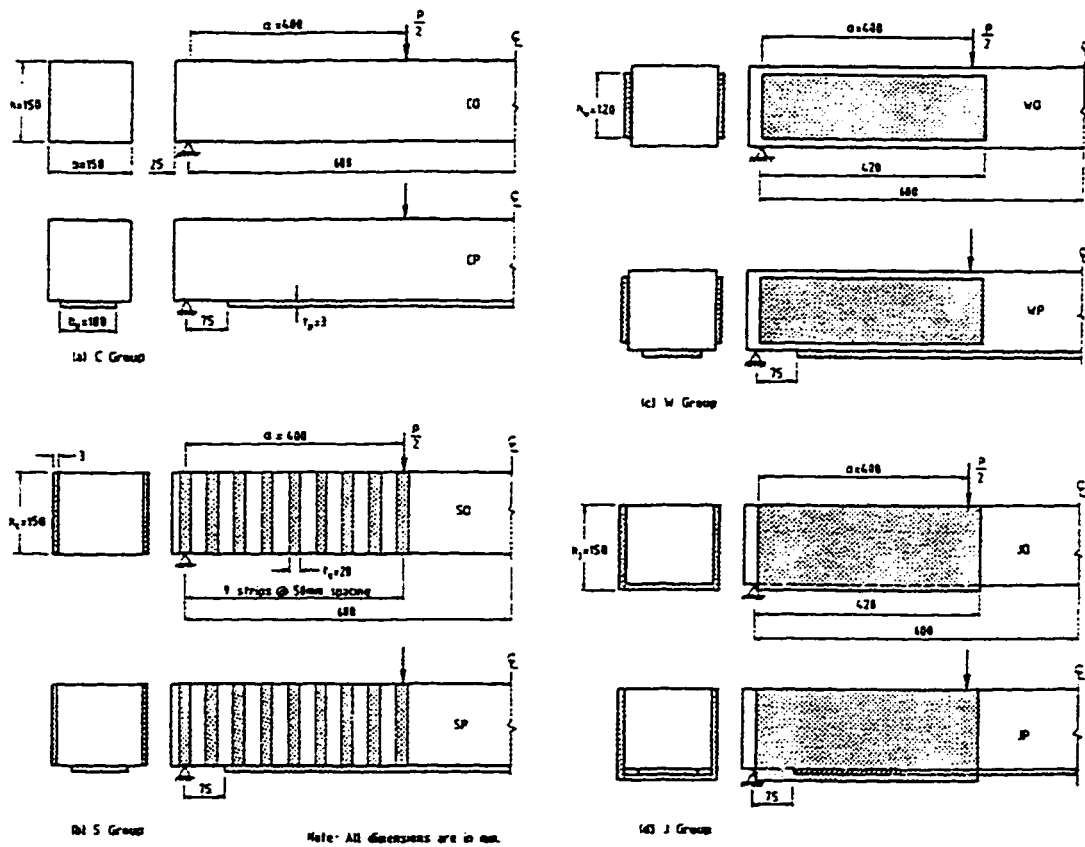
Reinforcing Layouts of Concrete Beams Reinforced with Composites for Flexure and Shear (Al-Sulaimani et al., 1994)
